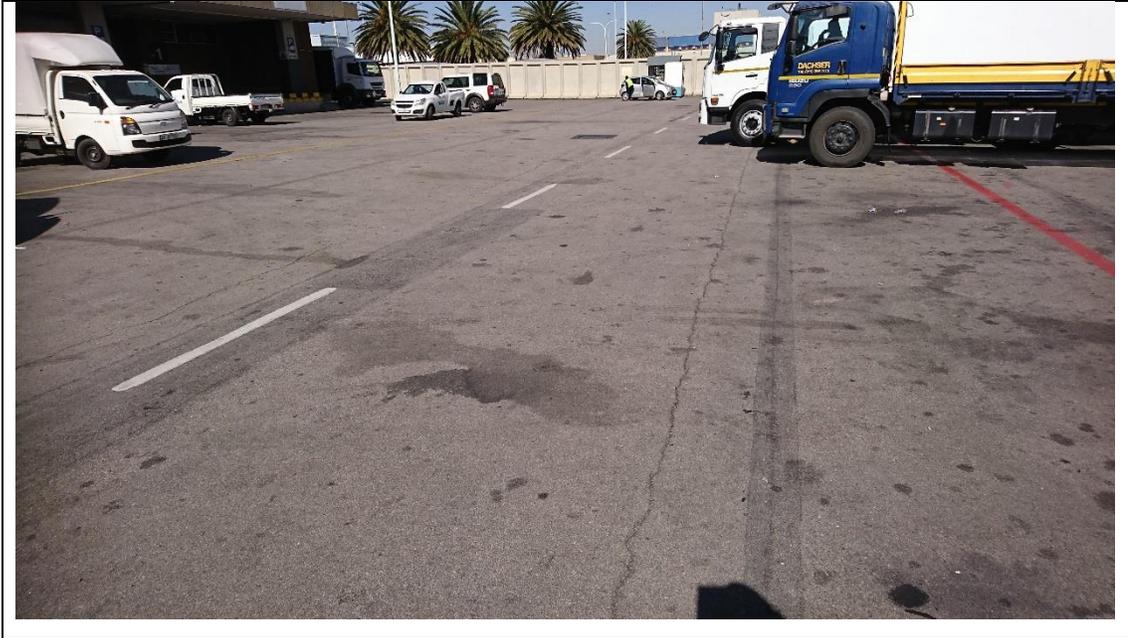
Longitudinal cracks in Cargo Warehouse loading area.
